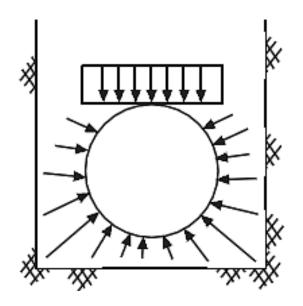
Load Transfer for Flexible Pipe (PPI 2008)
